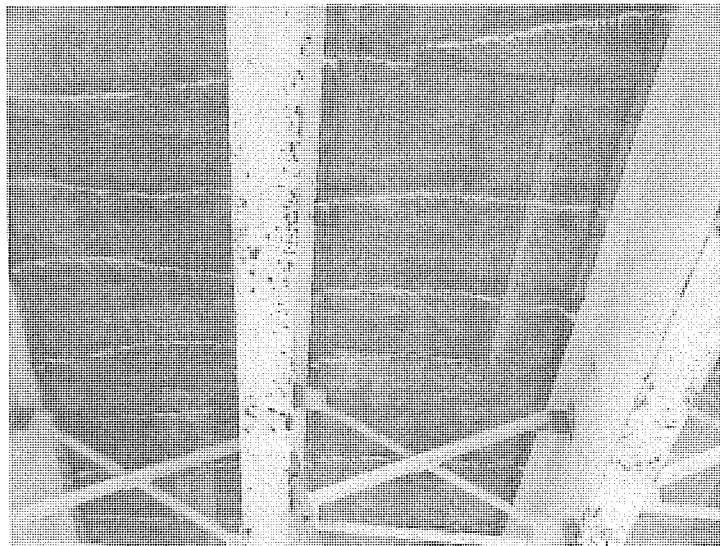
Transversal shrinkage cracks at the bottom of deck.
